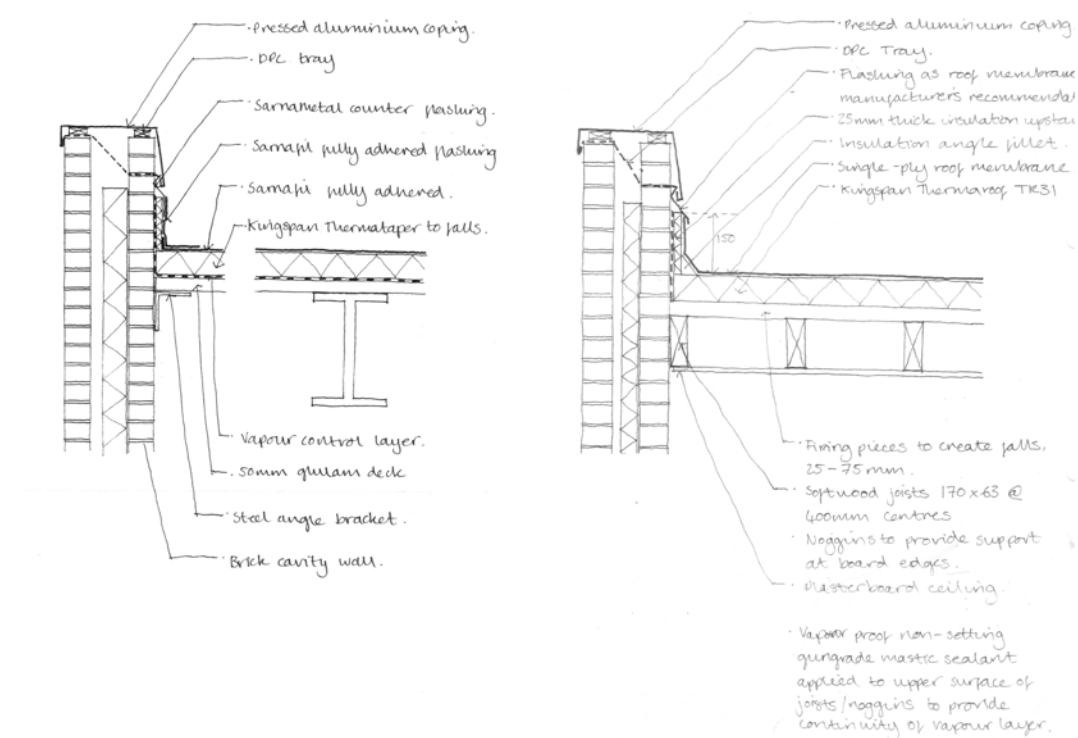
Proposed roof construction with visible structure. As built concealed timber roof structure
